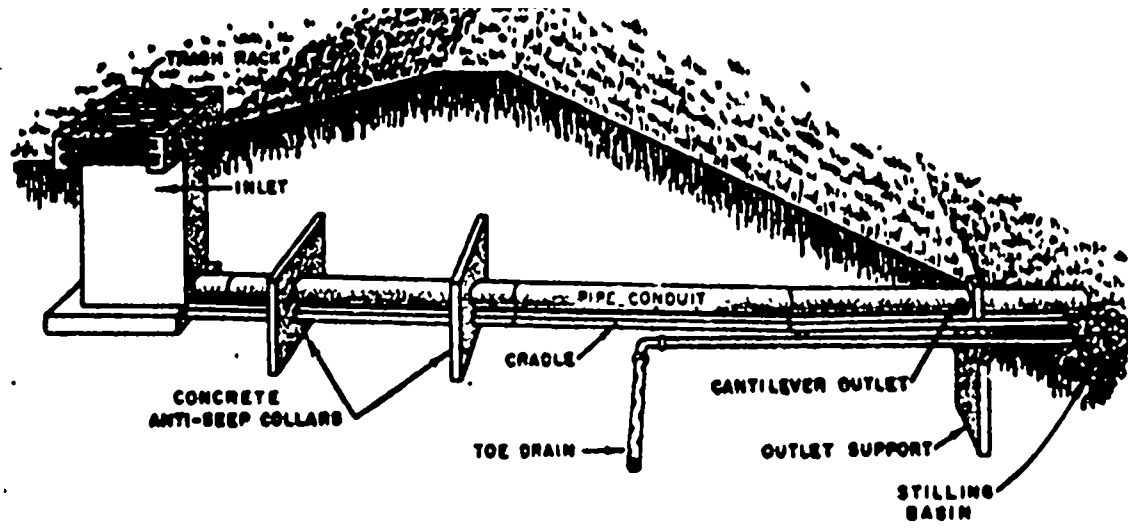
Reinforced Concrete Inlet and Pipe (U.S. Soil Conservation Service, 1969)
